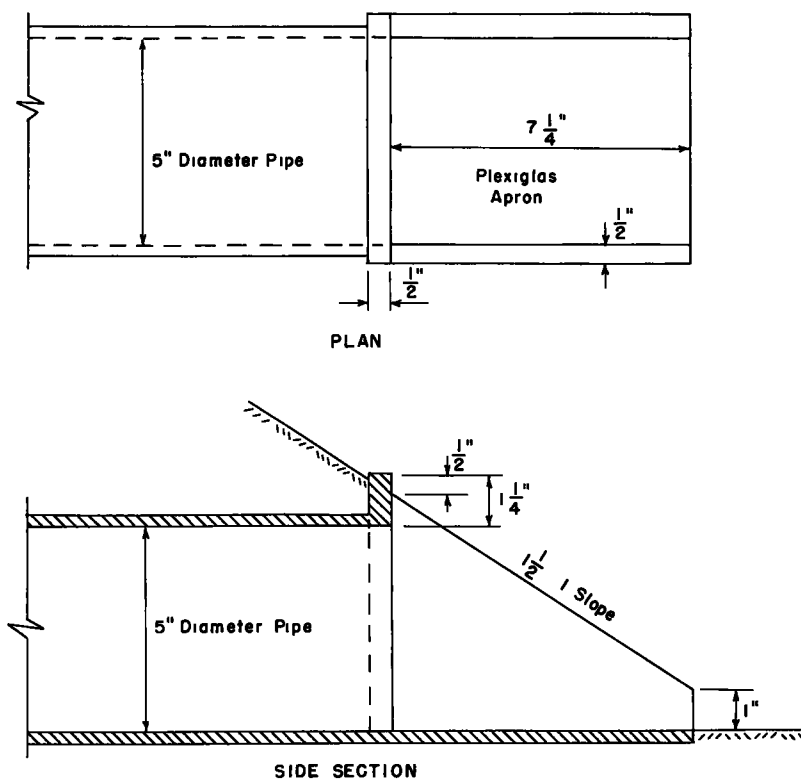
Details of Parallel Wingwall Inlet to Square Edged Pipe.
